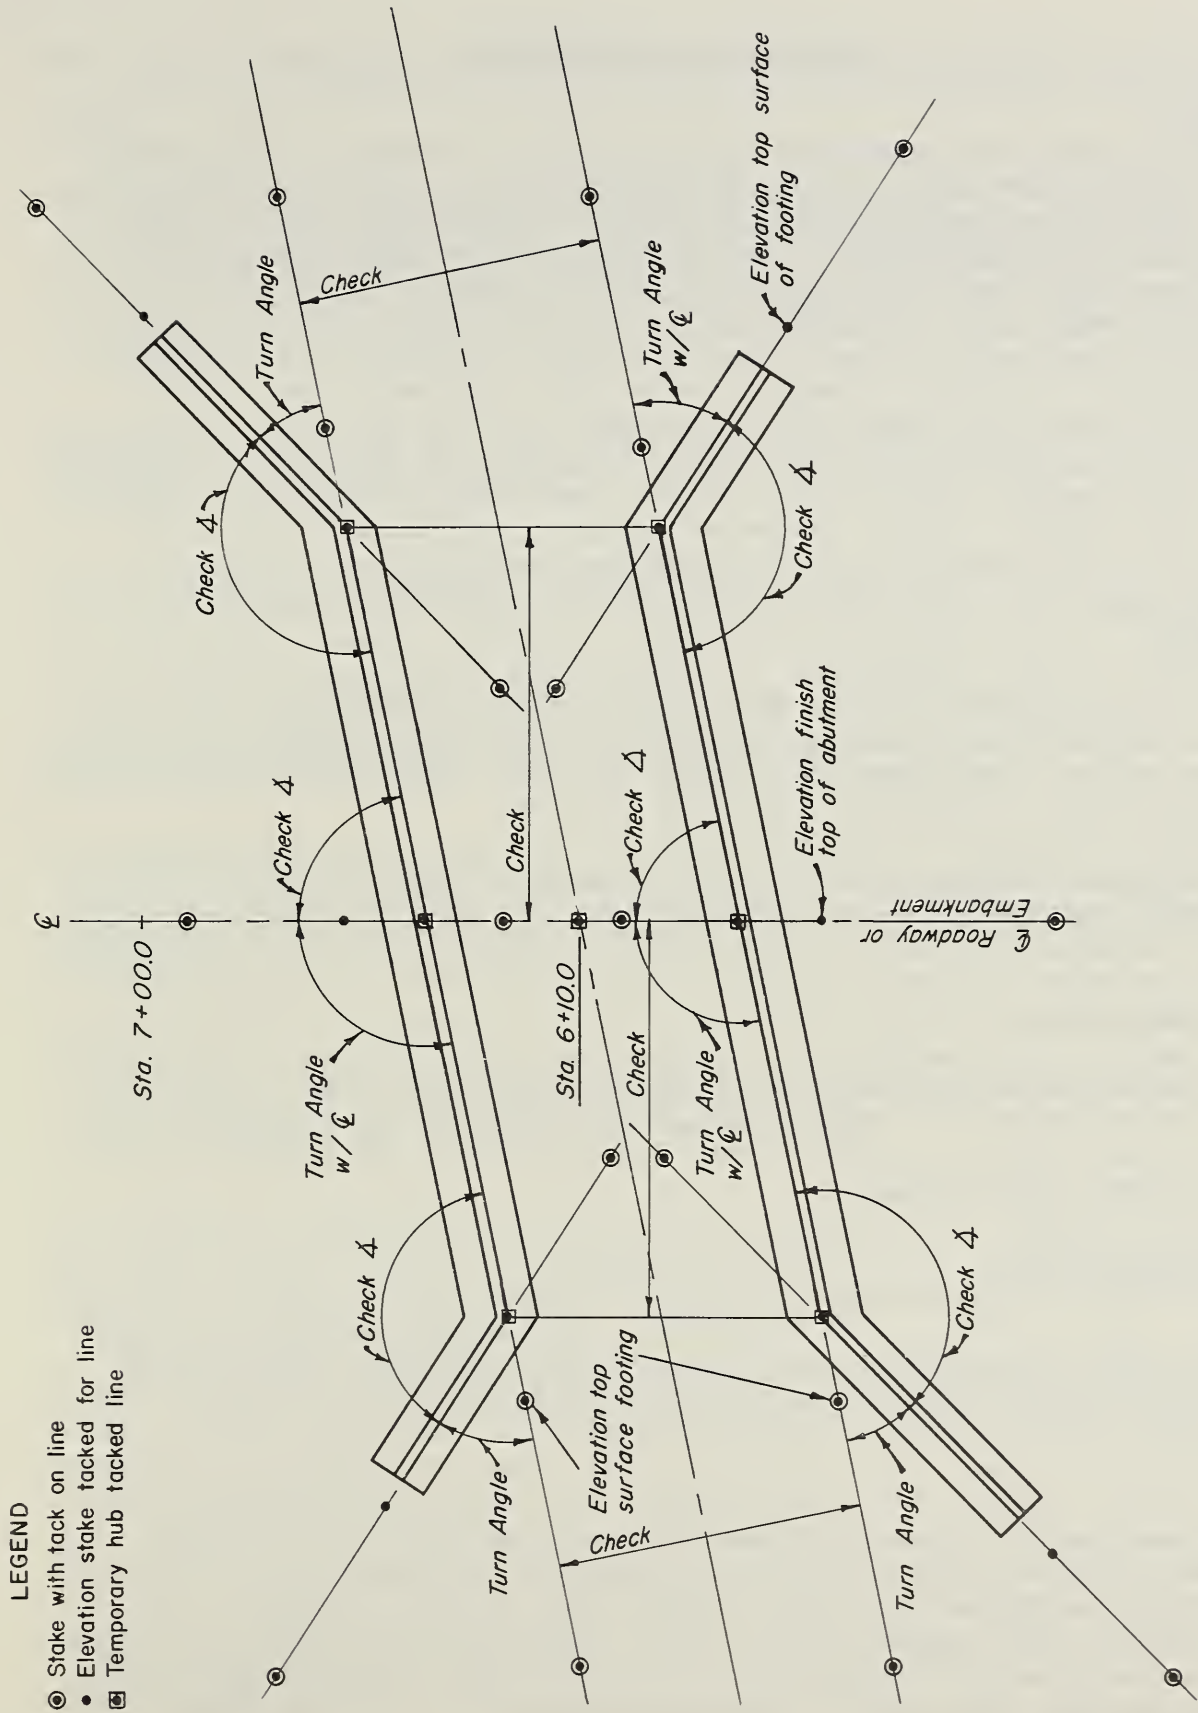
EXAMPLE FOR STAKING CANTILEVER ABUTMENTS ON SKEW ANGLE
